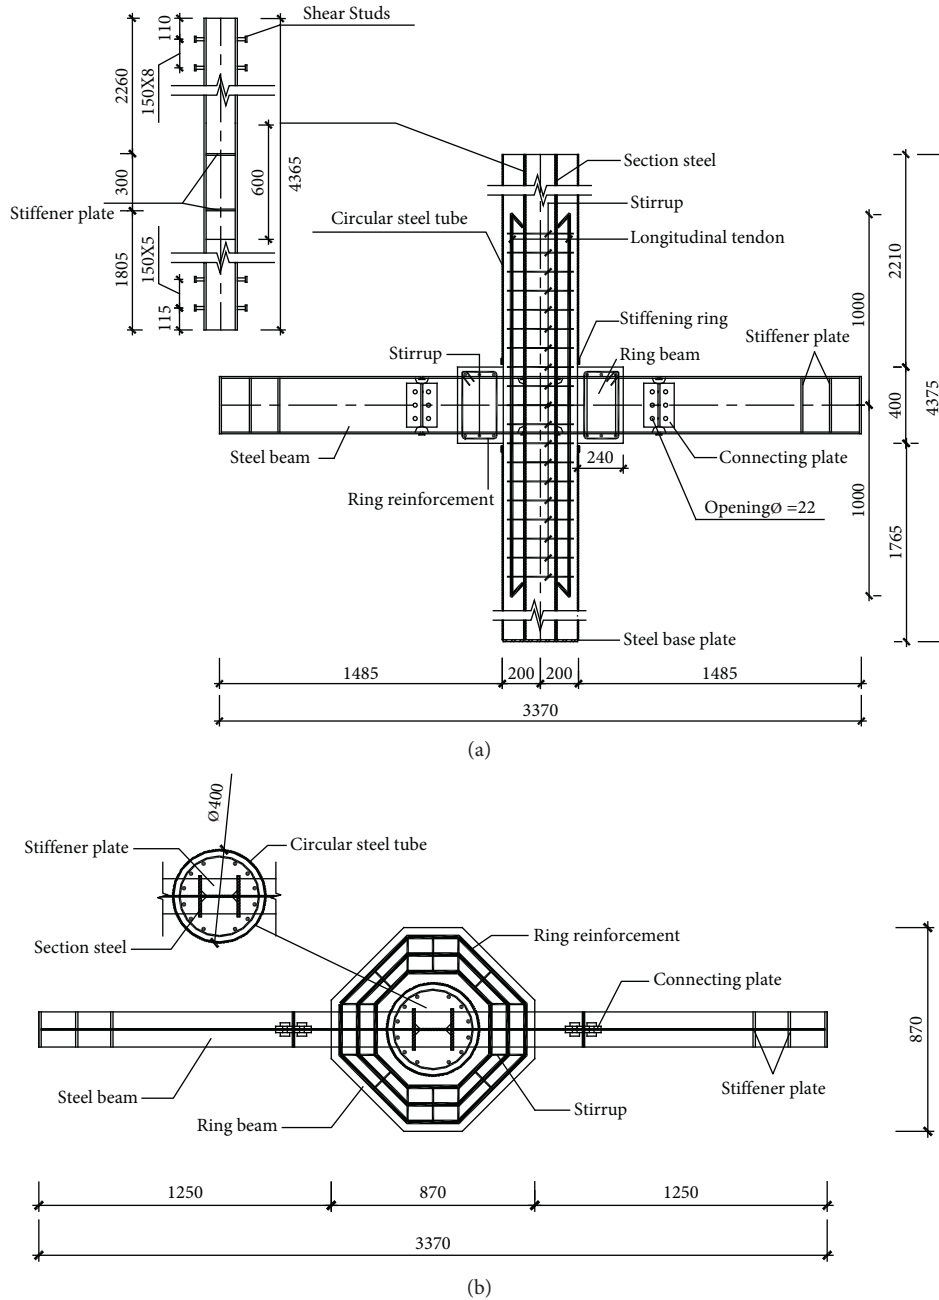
Structural diagram of the specimen (mm). (a) Elevation. (b) Plan.
